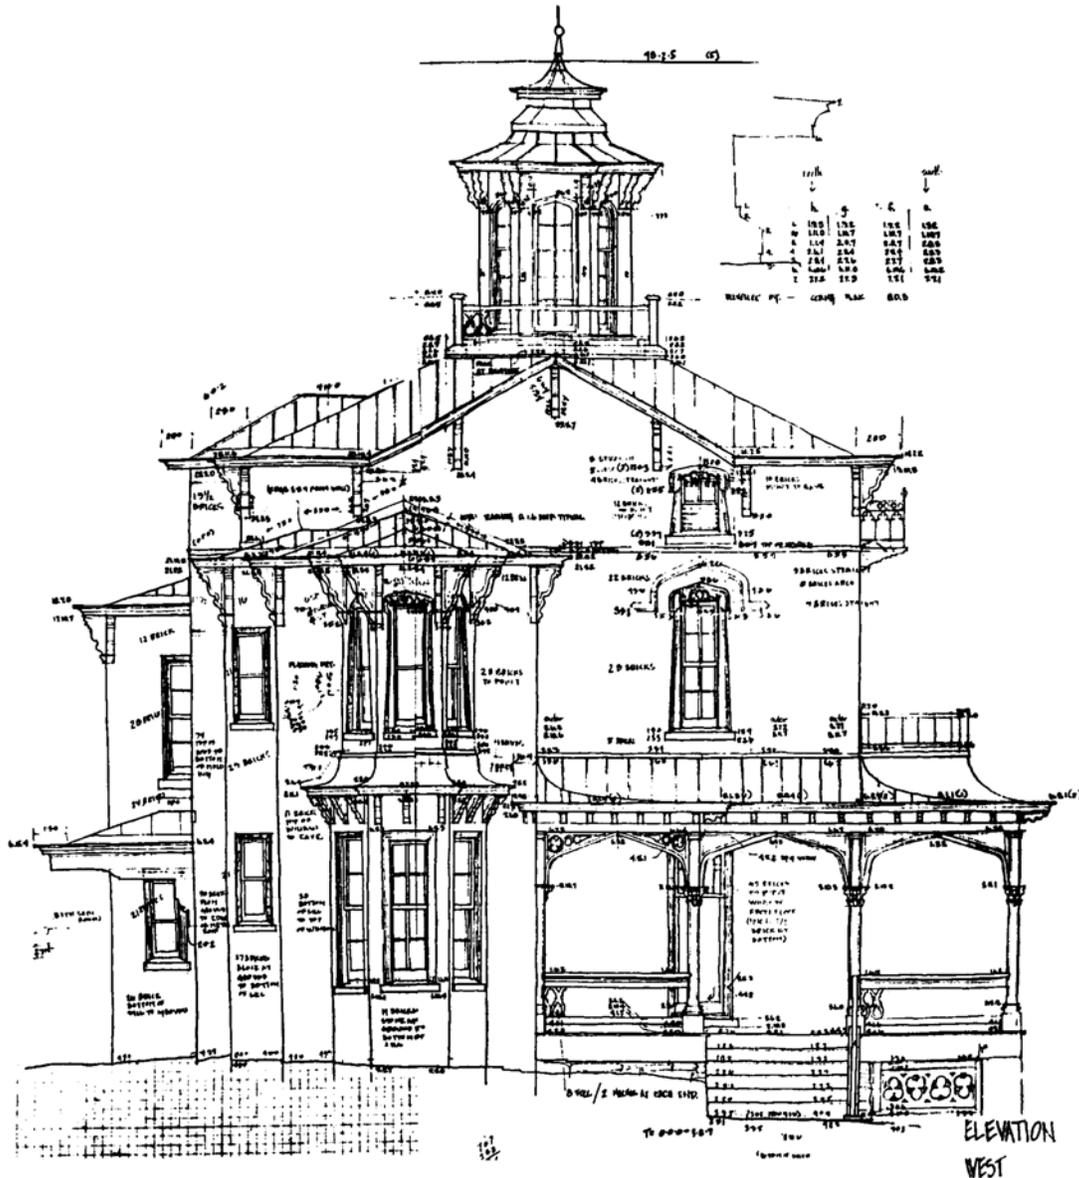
Field sketch of west elevation, Asa Packer Mansion, Jim Thorpe, Pennsylvania.
